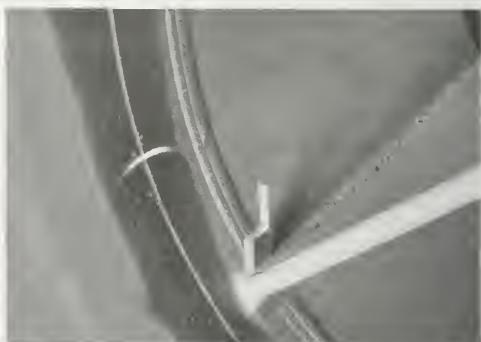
Concrete Placement Around Scroll Case and Turbine Pit Liner of Unit No. 1
